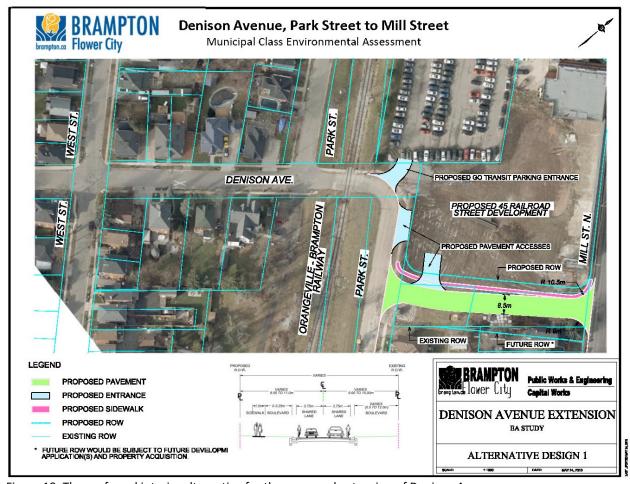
The preferred interim alternative for the proposed extension of Denison Avenue.
